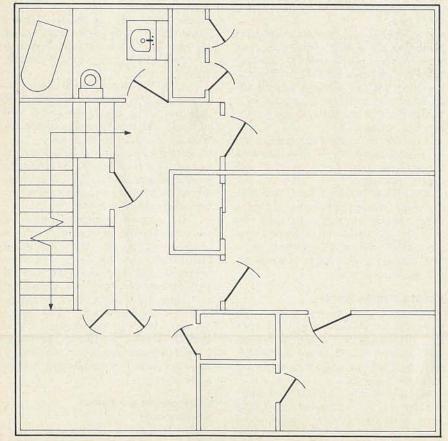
UPSTAIRS FLOORPLAN of a typical Colonial-style house without the furniture.
